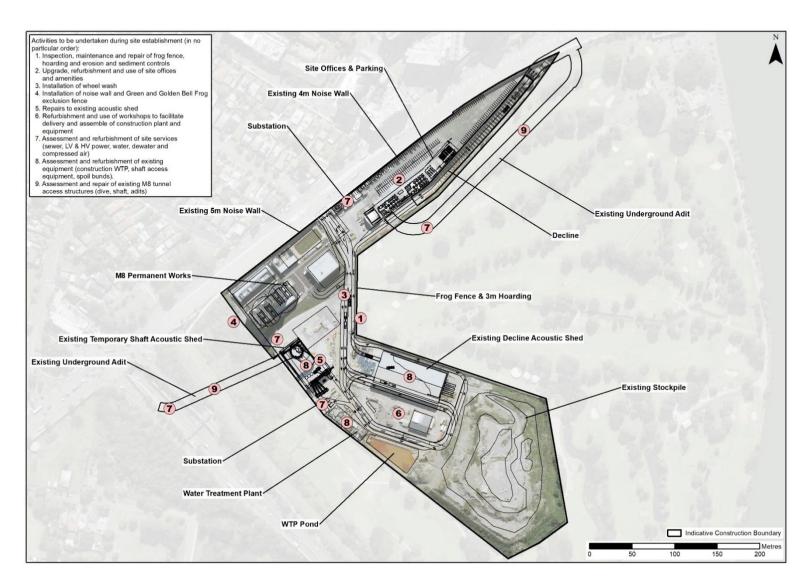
Preliminary construction at Arncliffe construction ancillary facility (C1)
